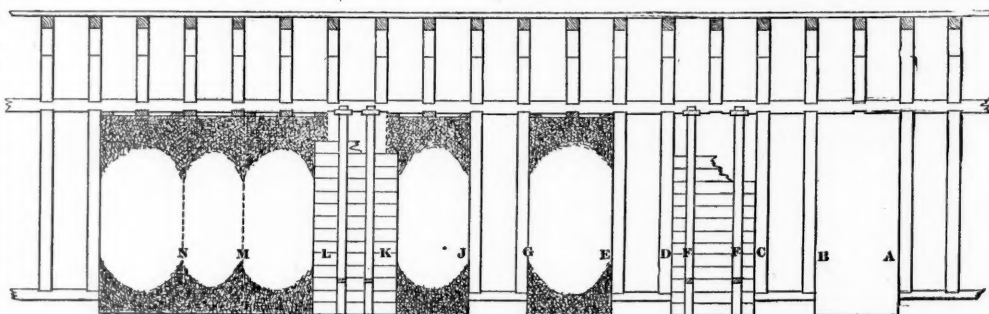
METHOD OF WALLING UNDER WALL-PLATE.
